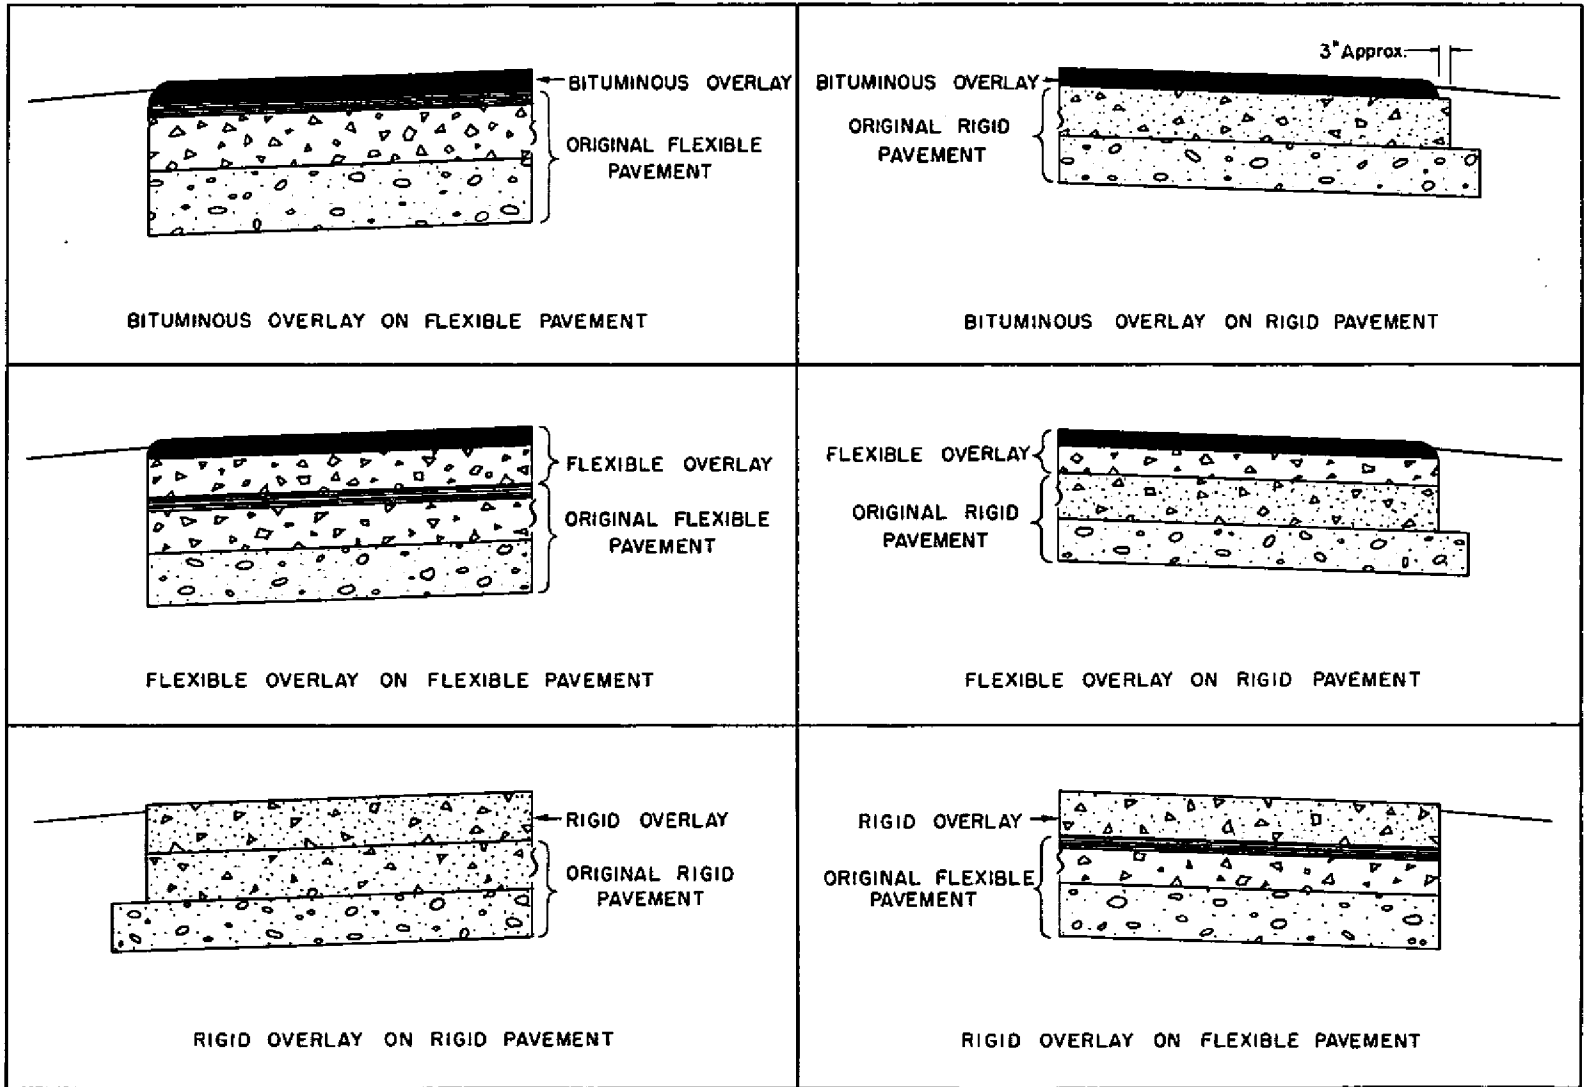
TYPICAL SECTIONS OF OVERLAY PAVEMENTS
